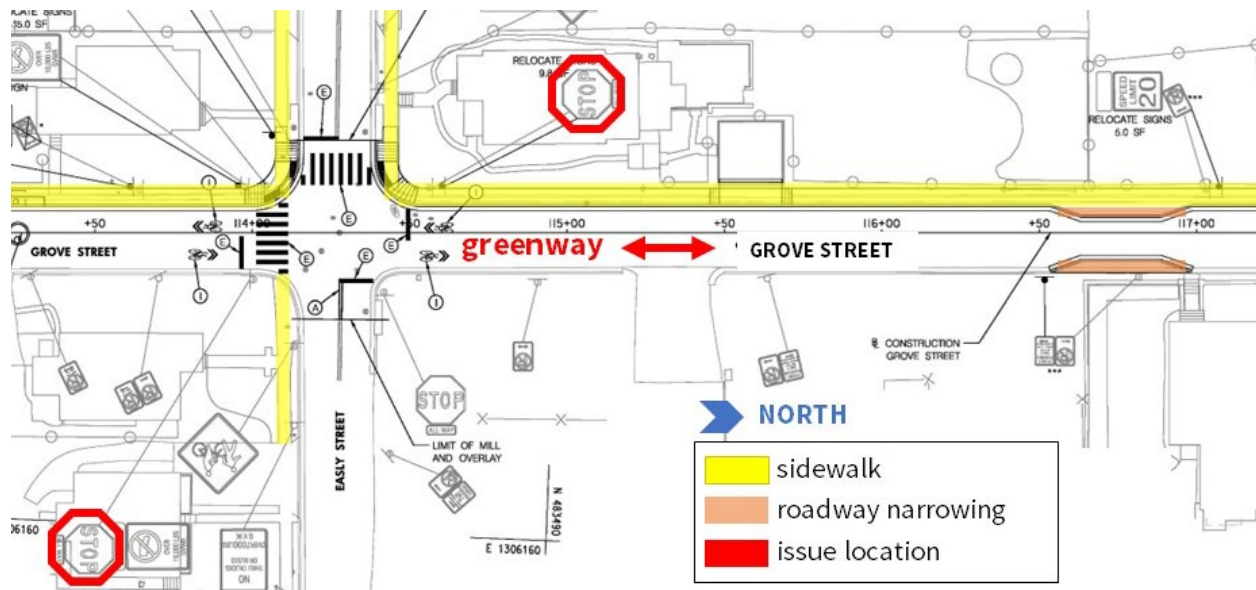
Section of Grove Street with Roadway Narrowing and Stop-Controlled Intersection
